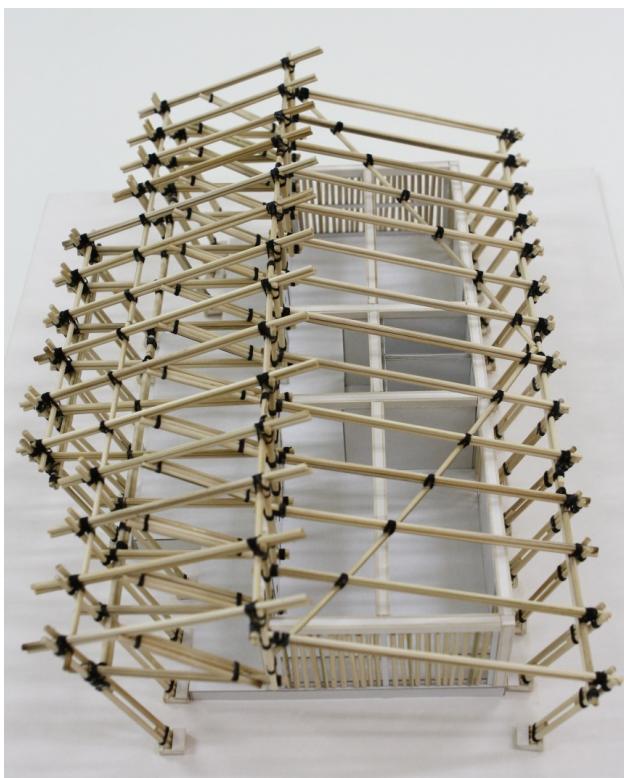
Scale model demonstrating structural network of bamboo trussing and supporting columns in the Millennium School Project.
